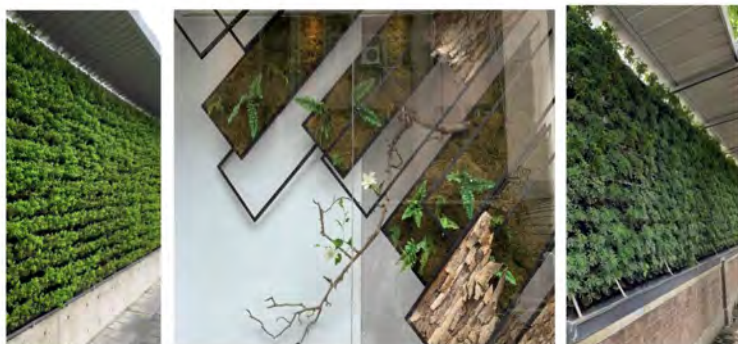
Dandy Hotel, construction site on the NTU campus, construction site in downtown Taipei (images by Chung-Kee Yeh)
